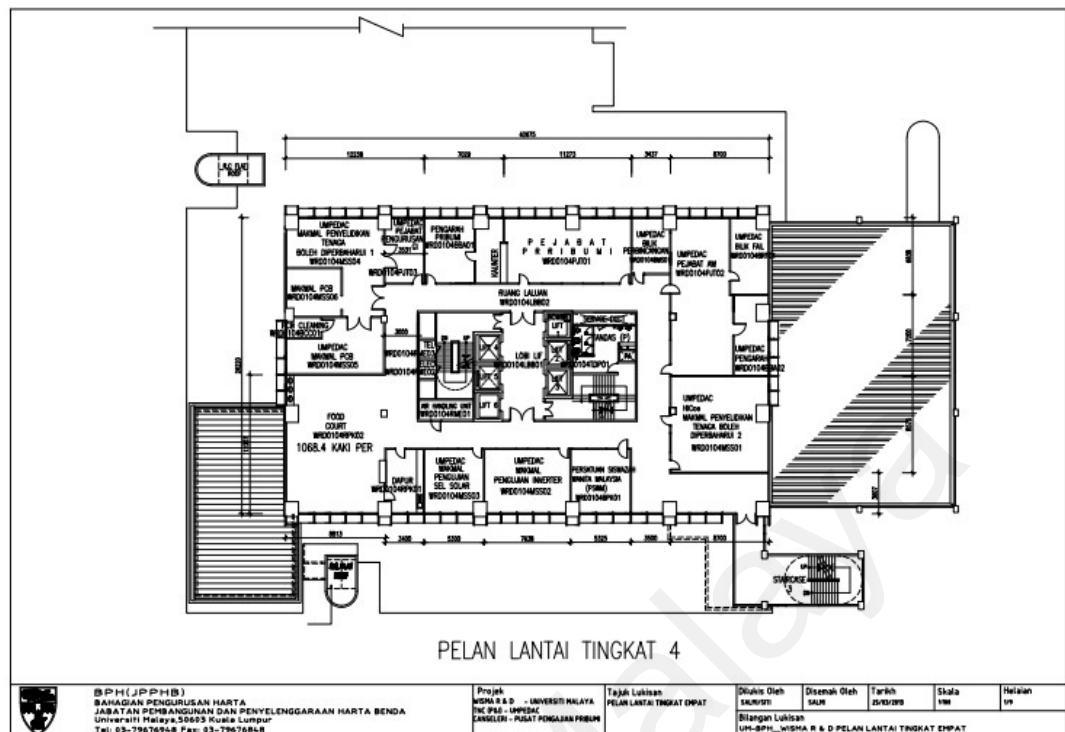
The layout plan of Level 4 of Wisma R&D
